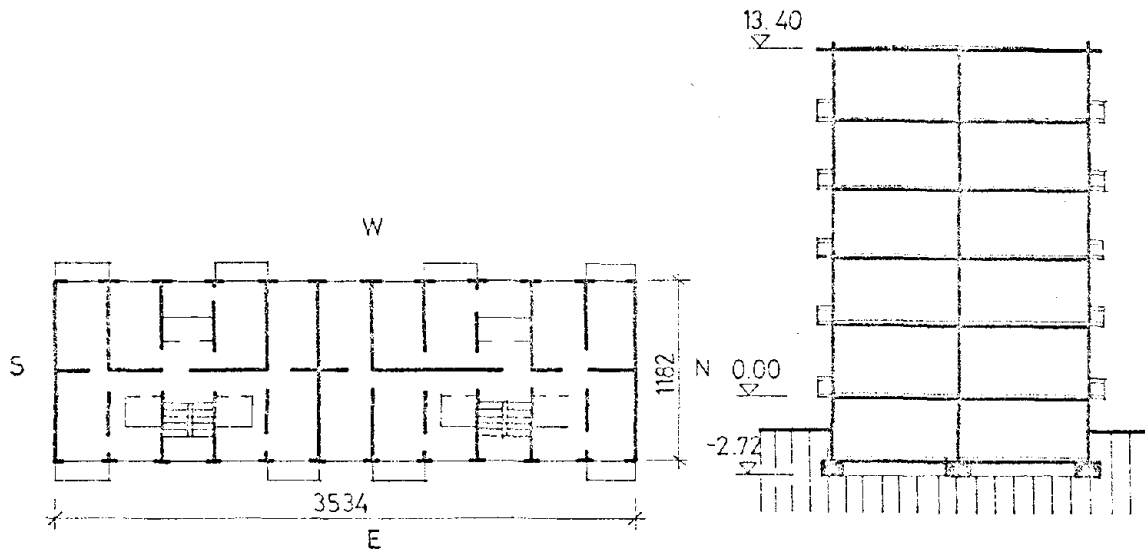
TYPICAL PLAN AND CROSS SECTION OF THE FIVE-STOREY BUILDING
